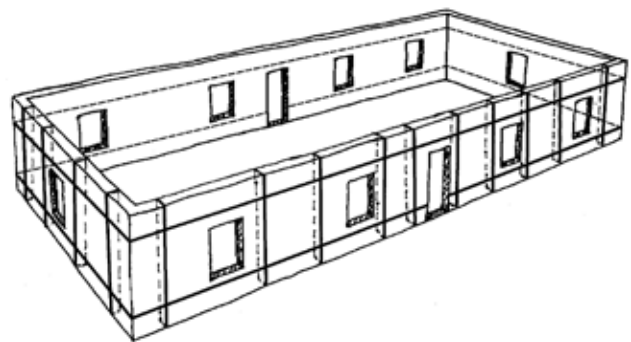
Vertical straps on the two adjacent walls, in addition to upper and lower horizontal straps.
